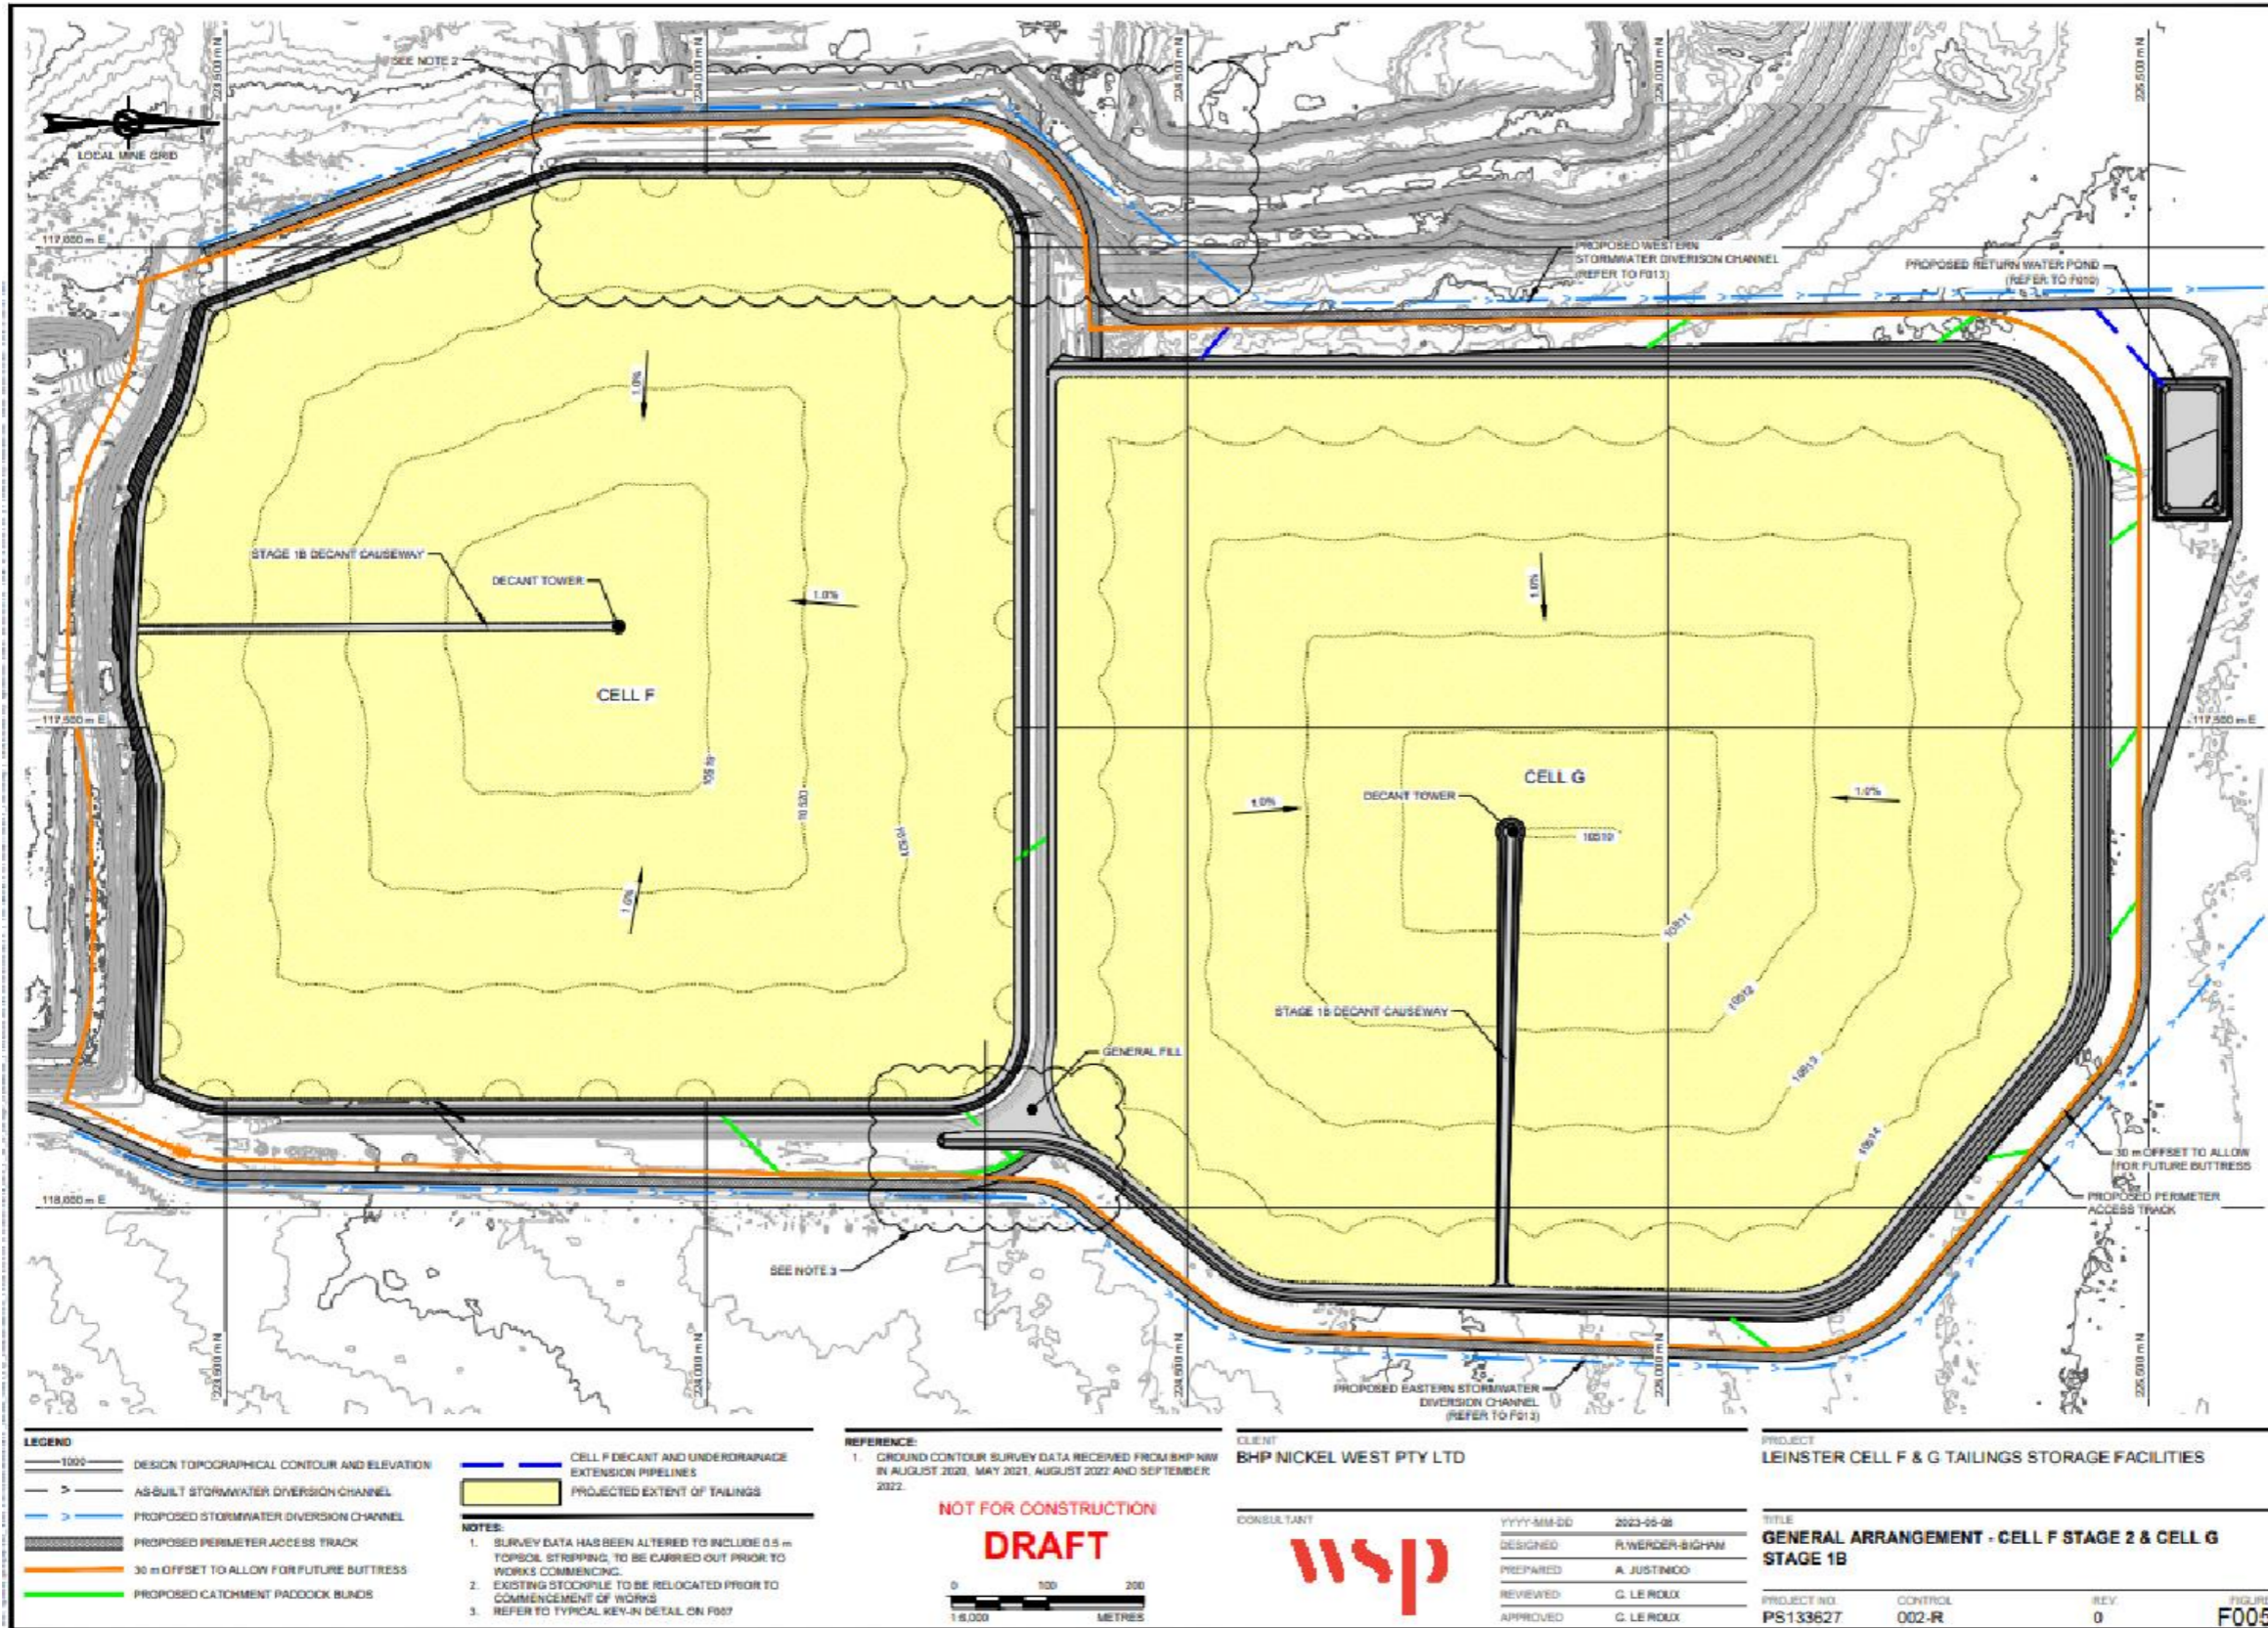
Tailings Storage Facilities Cell 3F (Stage 2) and Cell 3G (Stage 1B) and Return Water Pond general layout.
